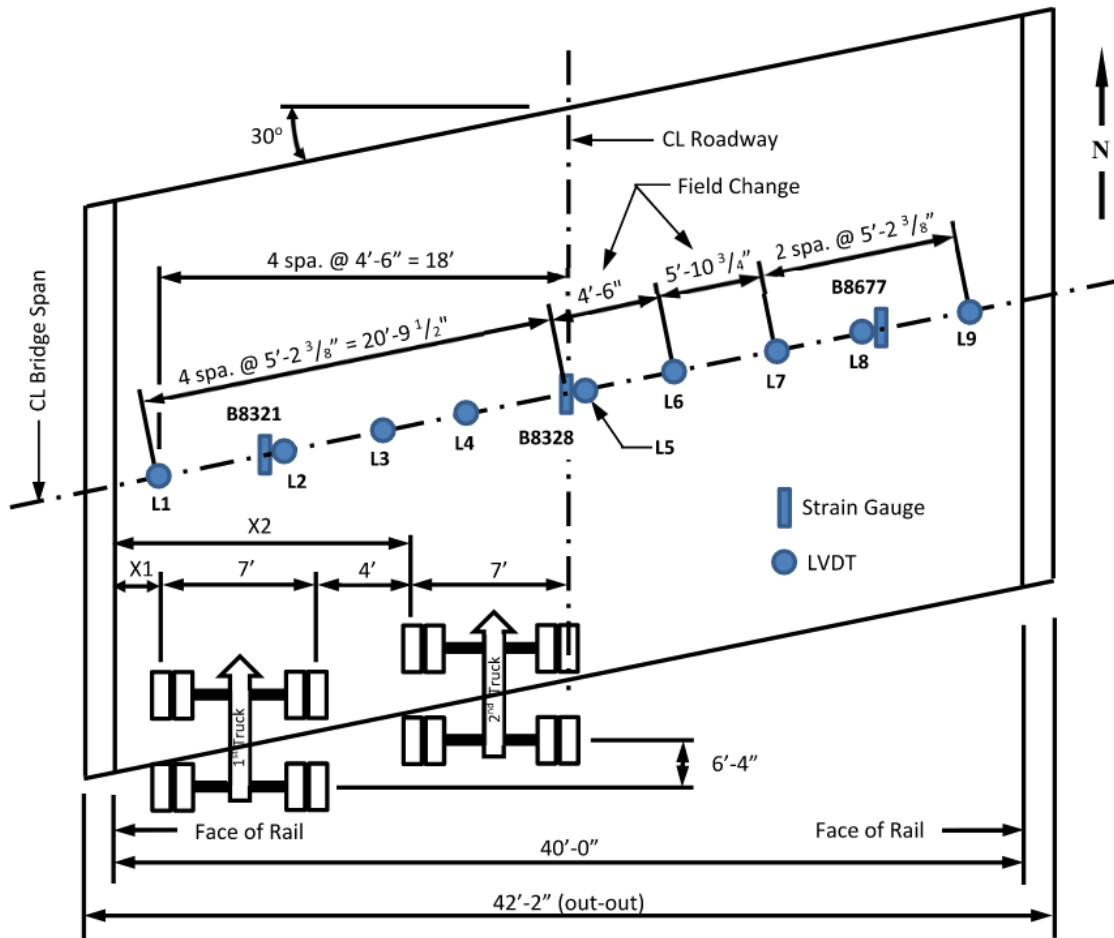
Illustration. Instrumentation plan of 0740016 bridge.
